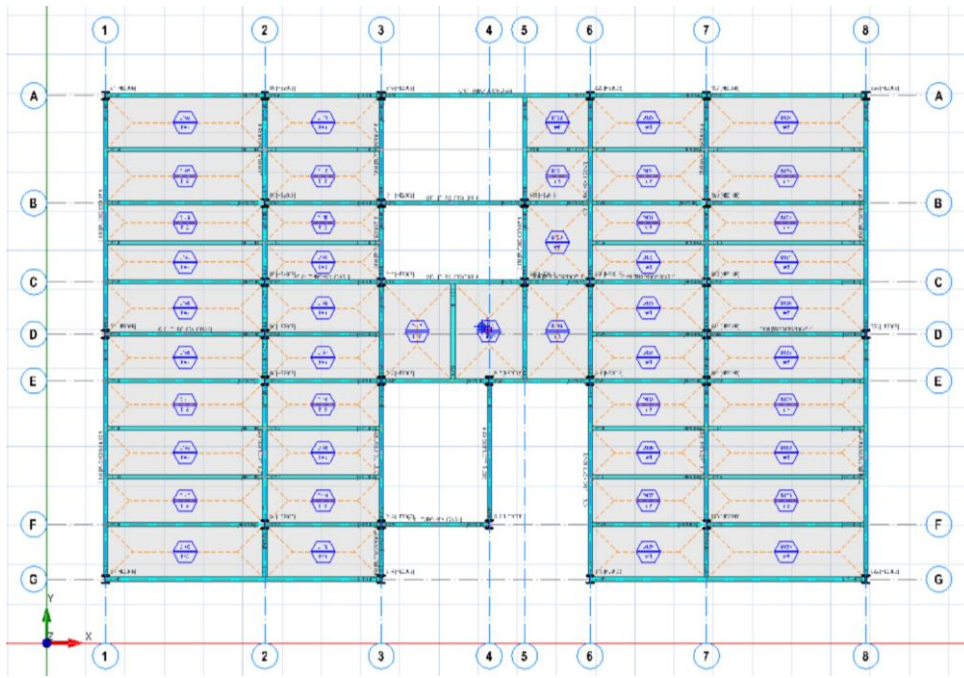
Floor Plan of Steel Model in ProtaStructure
